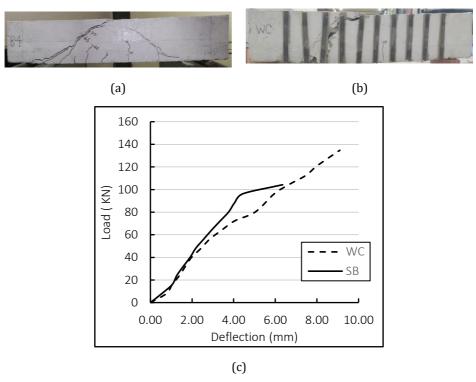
(a) Damaged beam for WC, (b) Failure mode of beam WC, (c) Deflections of beams WC and SB
